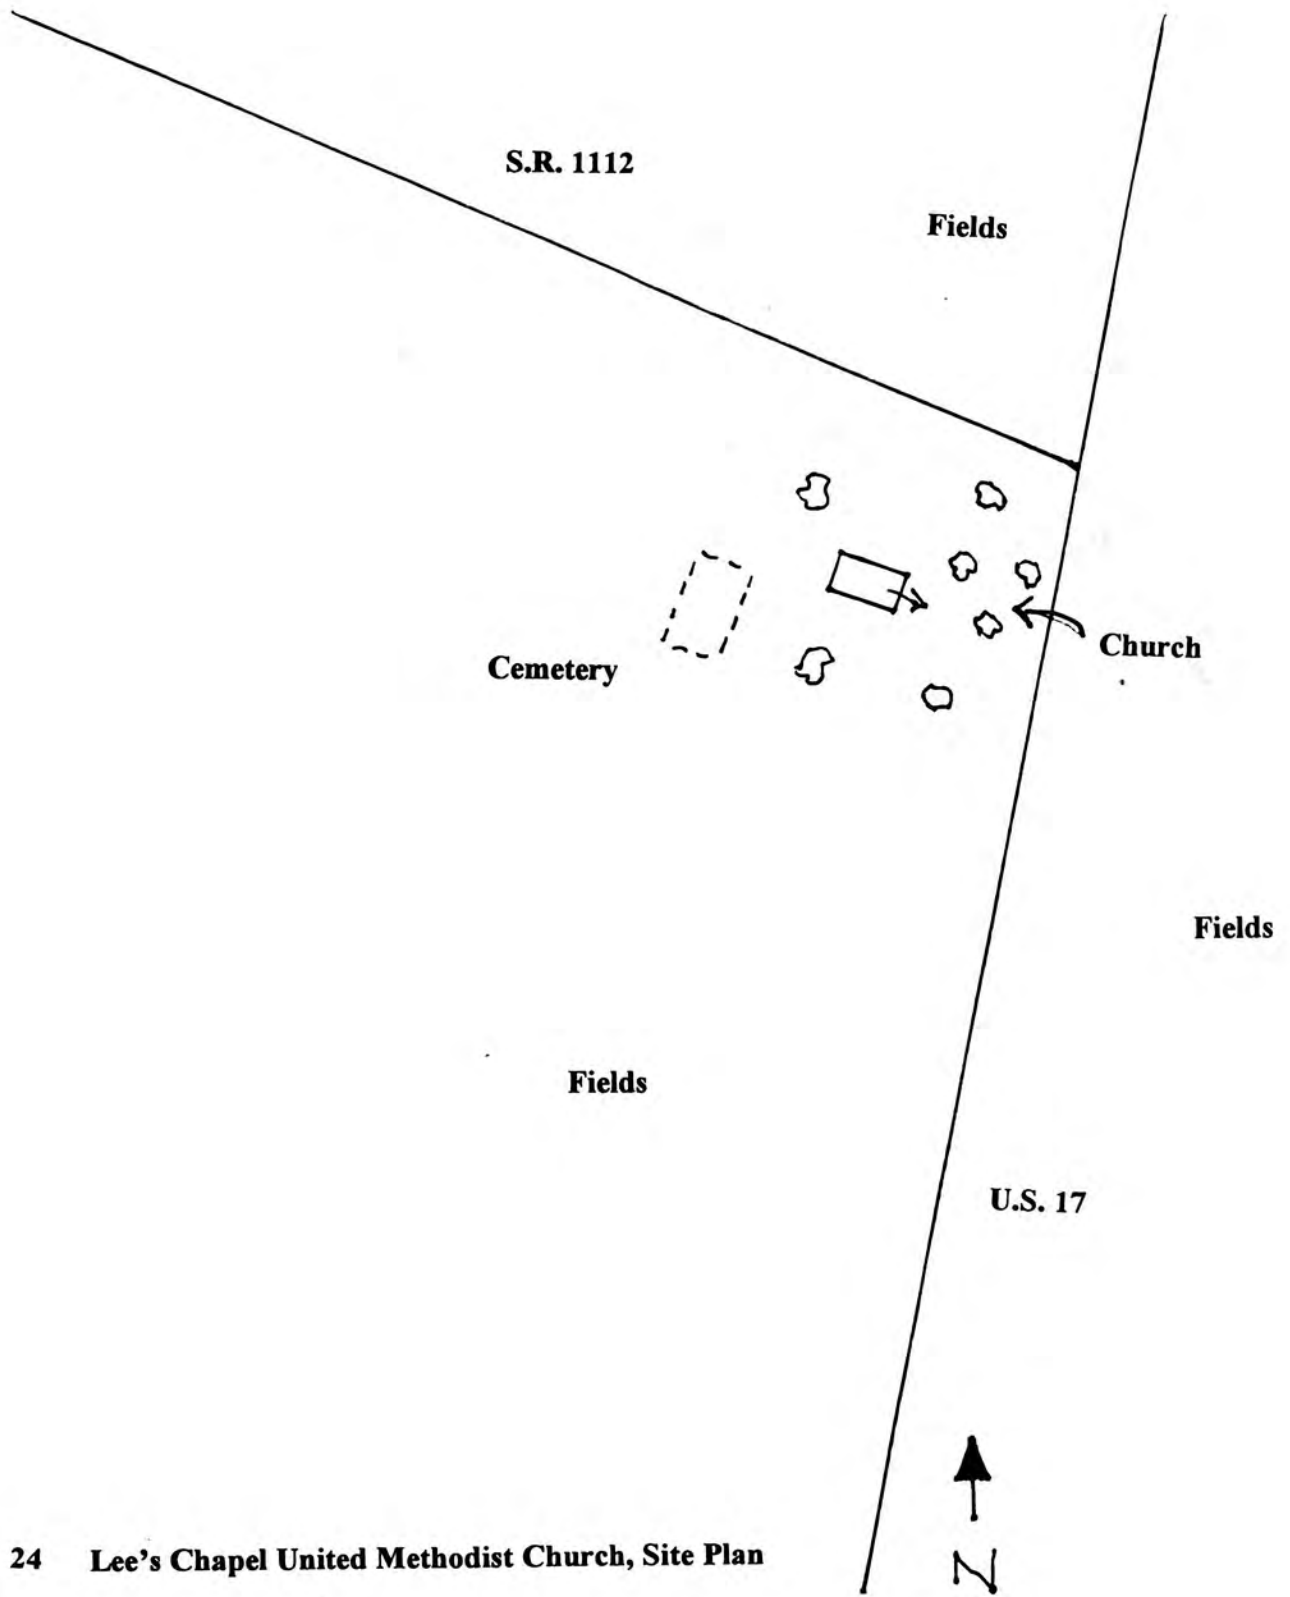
Lee's Chapel United Methodist Church, Site Plan
